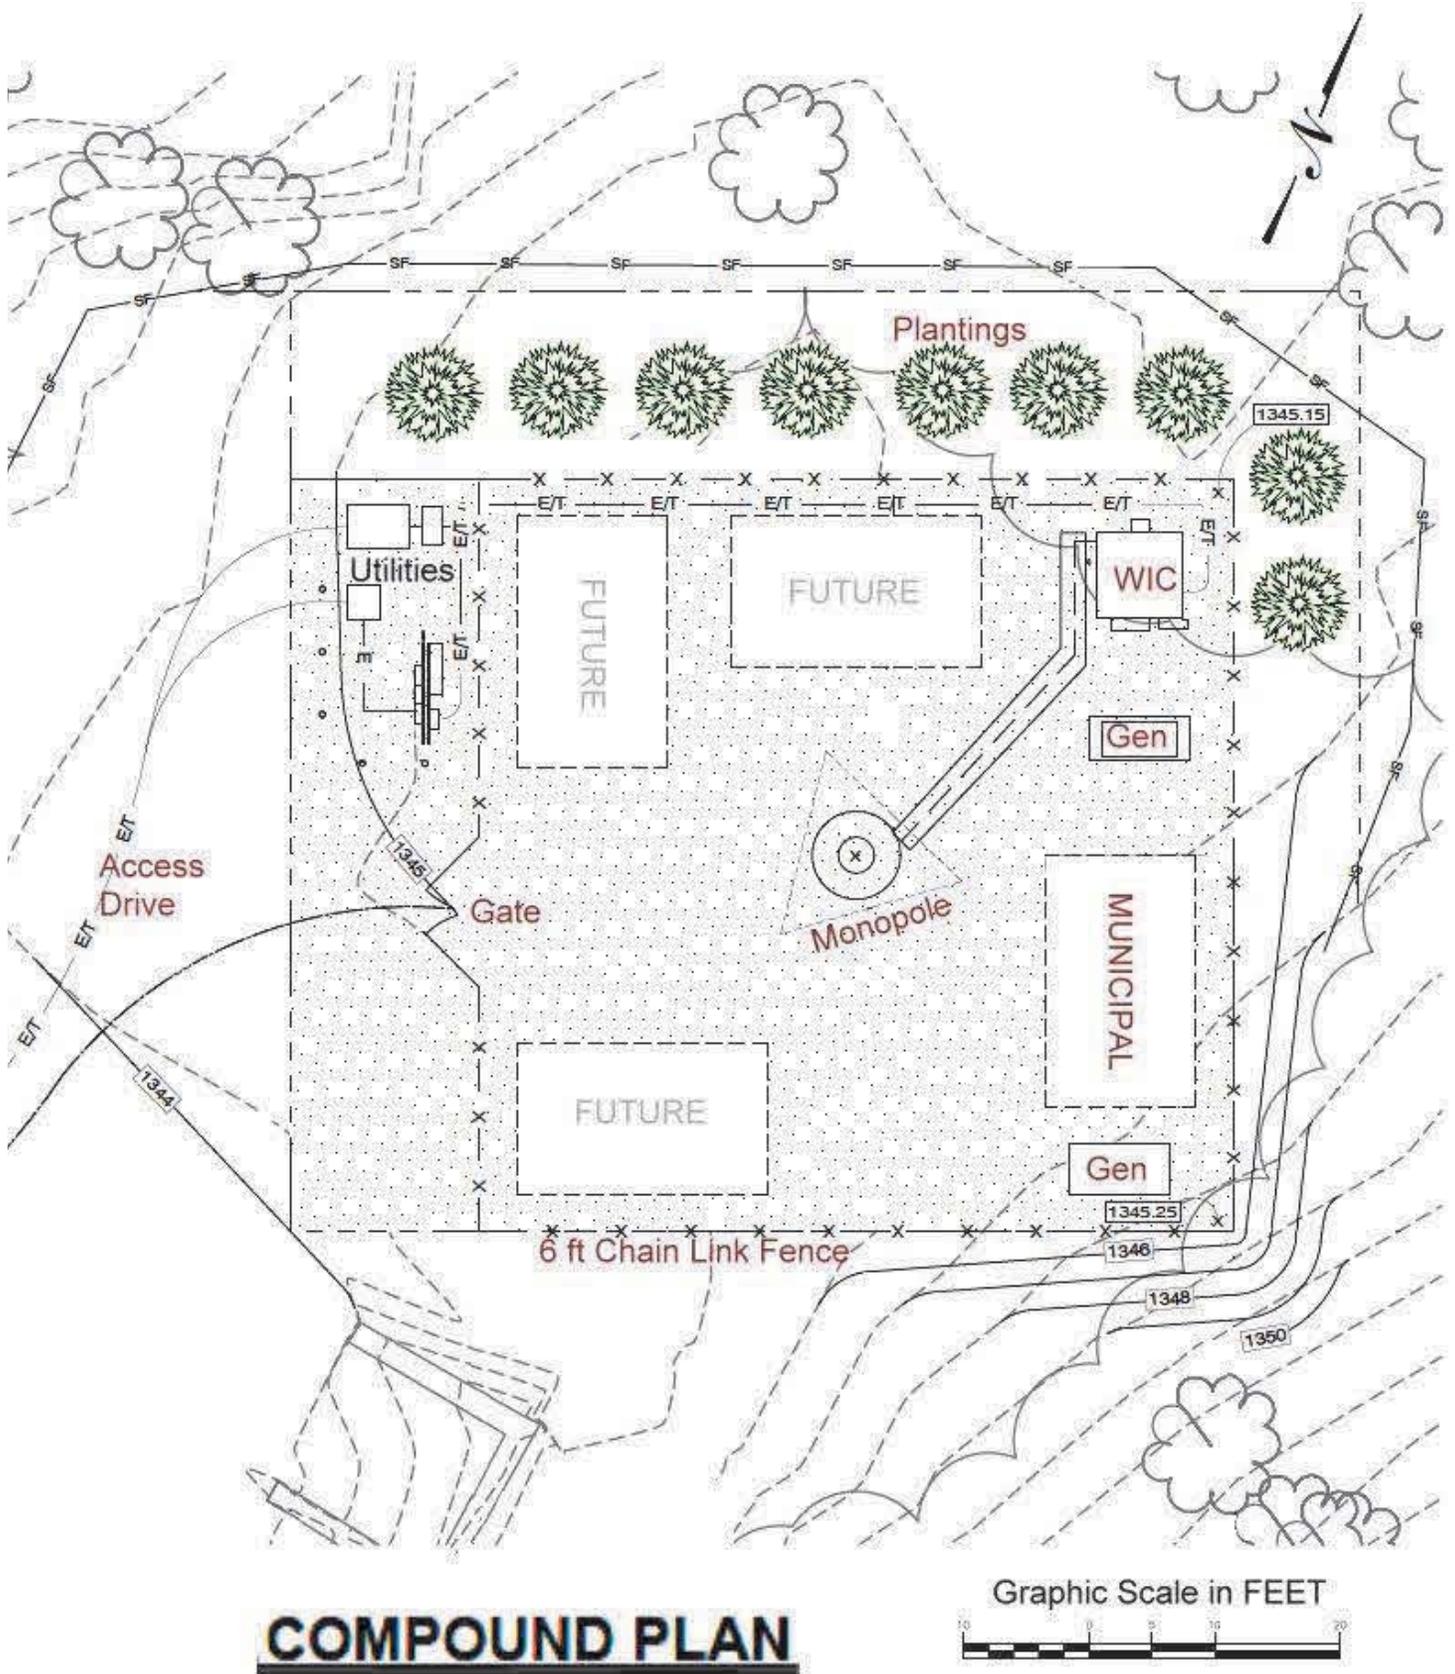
Plan Showing the Proposed Layout of the Equipment Compound
